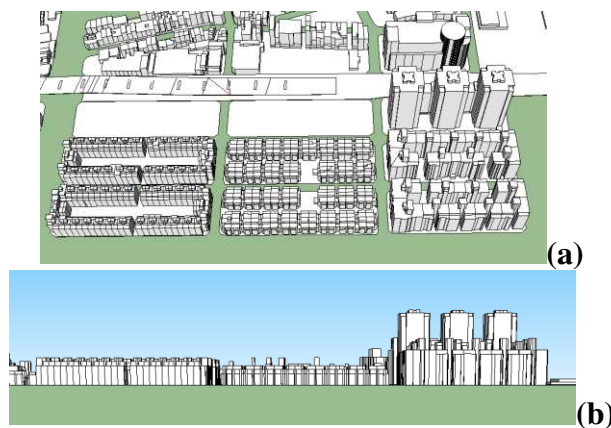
Community residential building plan 1 (current situation). (a) Perspective view. (b) The south elevation view
